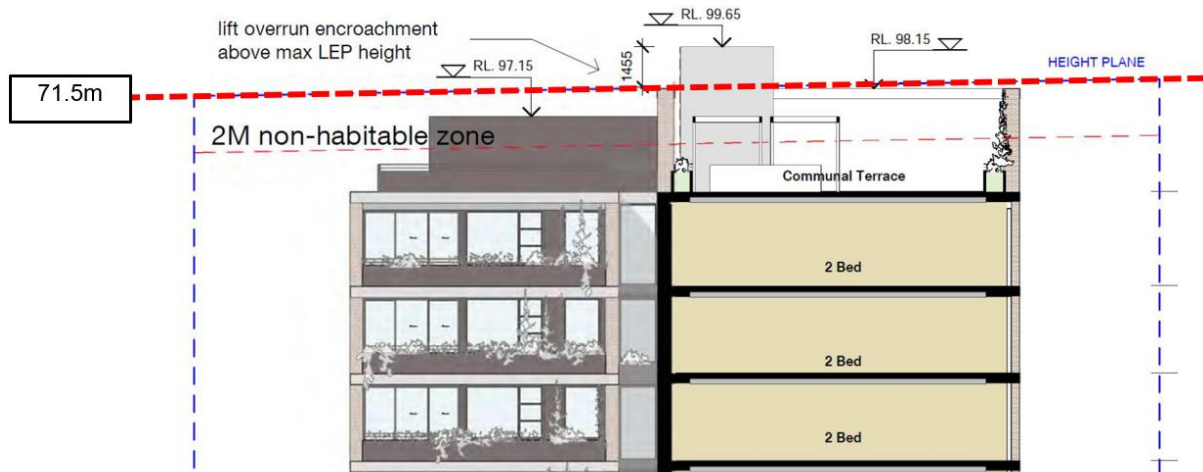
Section plan showing Tower Building exceeding the height of buildings standard, including the lift overrun
